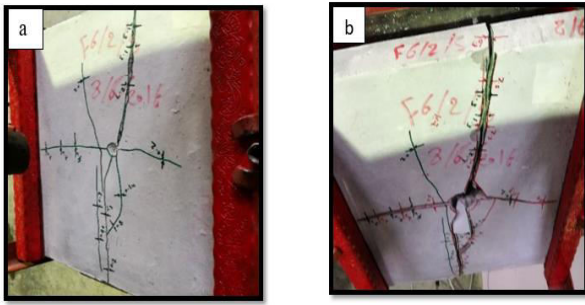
Crack pattern of micro steel fibre: a) initial crack of simply support. b) final crack of simply support.
